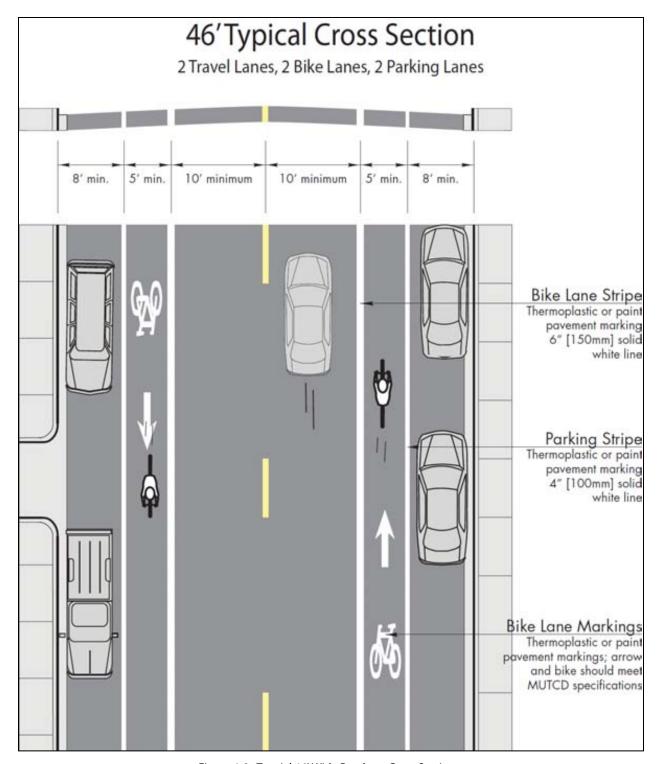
Typcial 46' Wide Roadway Cross Section
